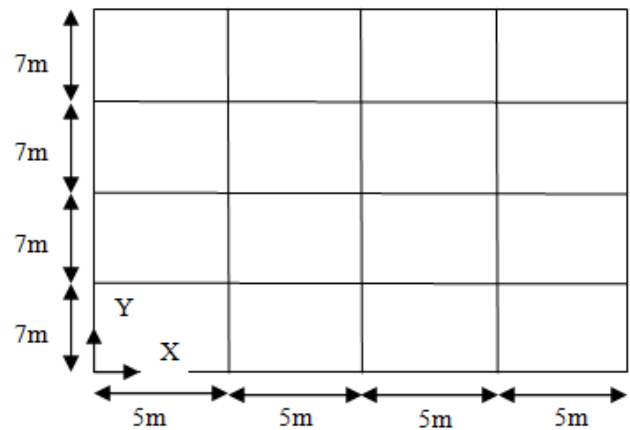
Typical Plan of G+3, G+10 and G+20 Building Models
